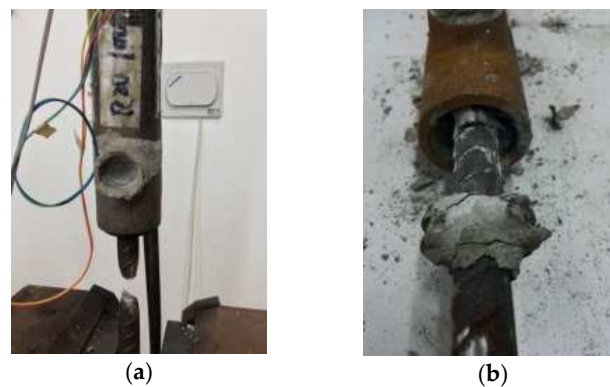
Typical failure modes of the GSS connectors. (a) Rebar rupture failure. (b) Bond-slip failure of rebar-grout.
